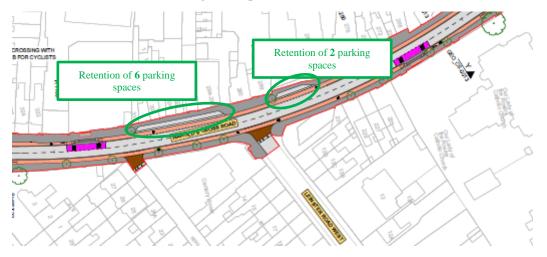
Proposed scheme design on Harold's Cross Road at Leinster Road West
